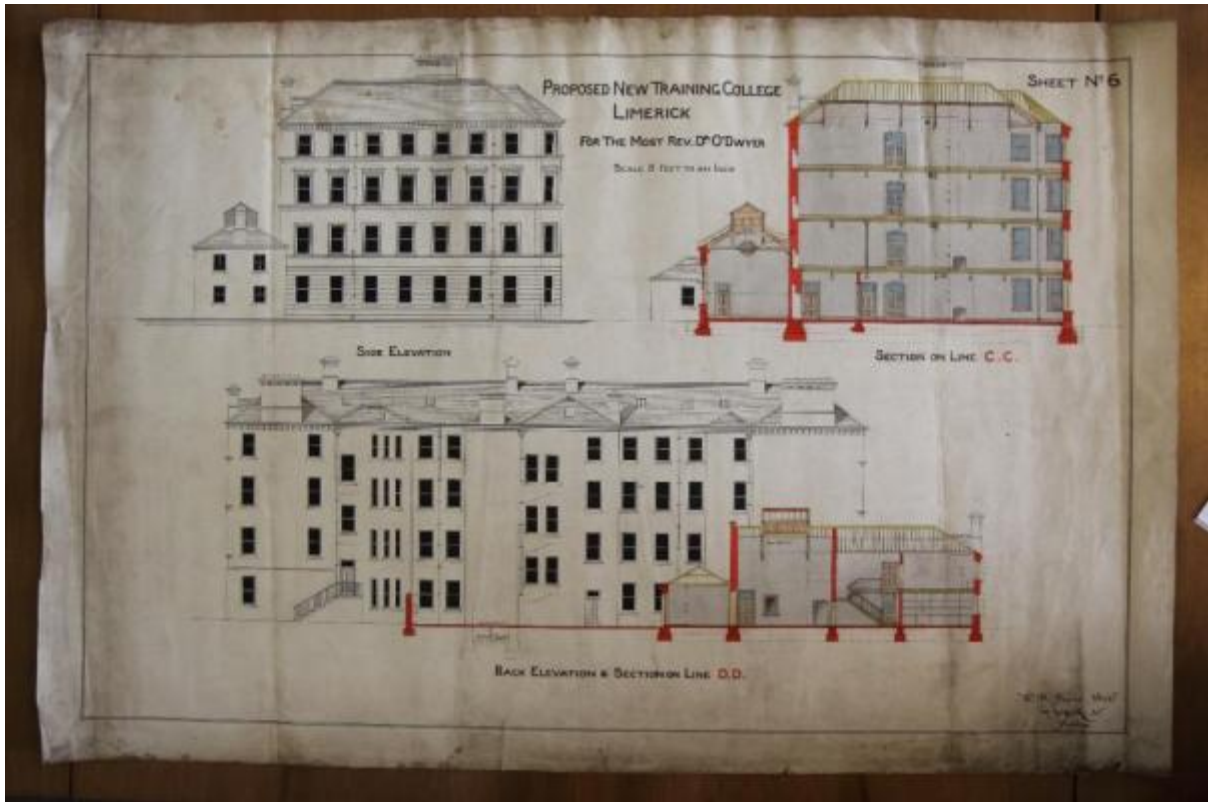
Mary Immaculate College Section Drawings - Irish Architectural Archive
